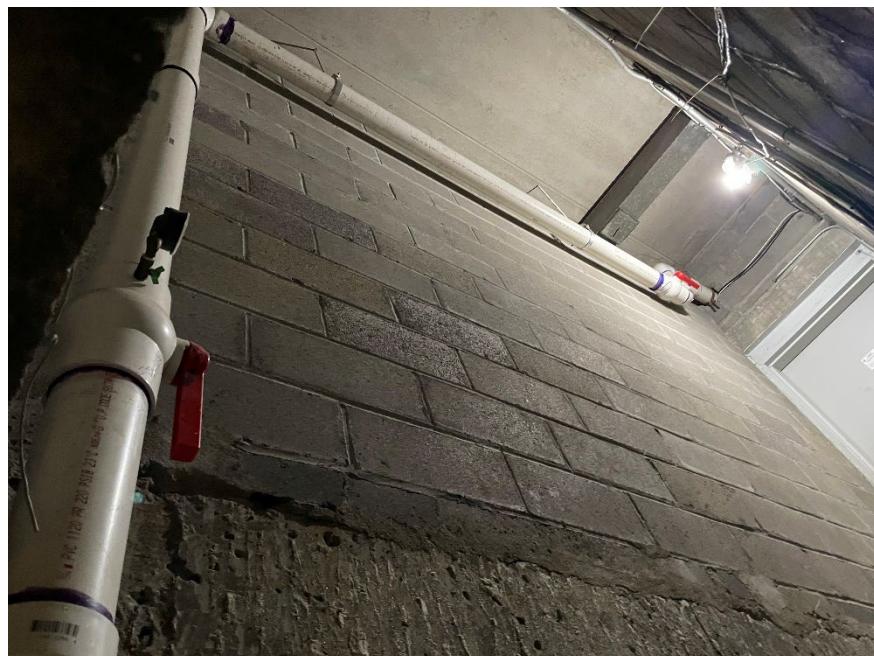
SSDS piping run leading down from the first floor and into the boiler room wall.
